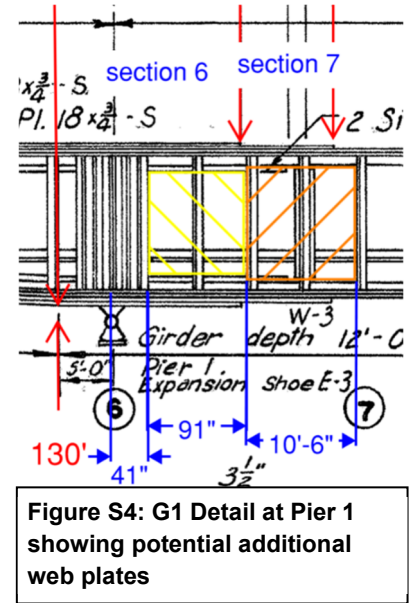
G1 Detail at Pier 1 showing potential additional web plates
